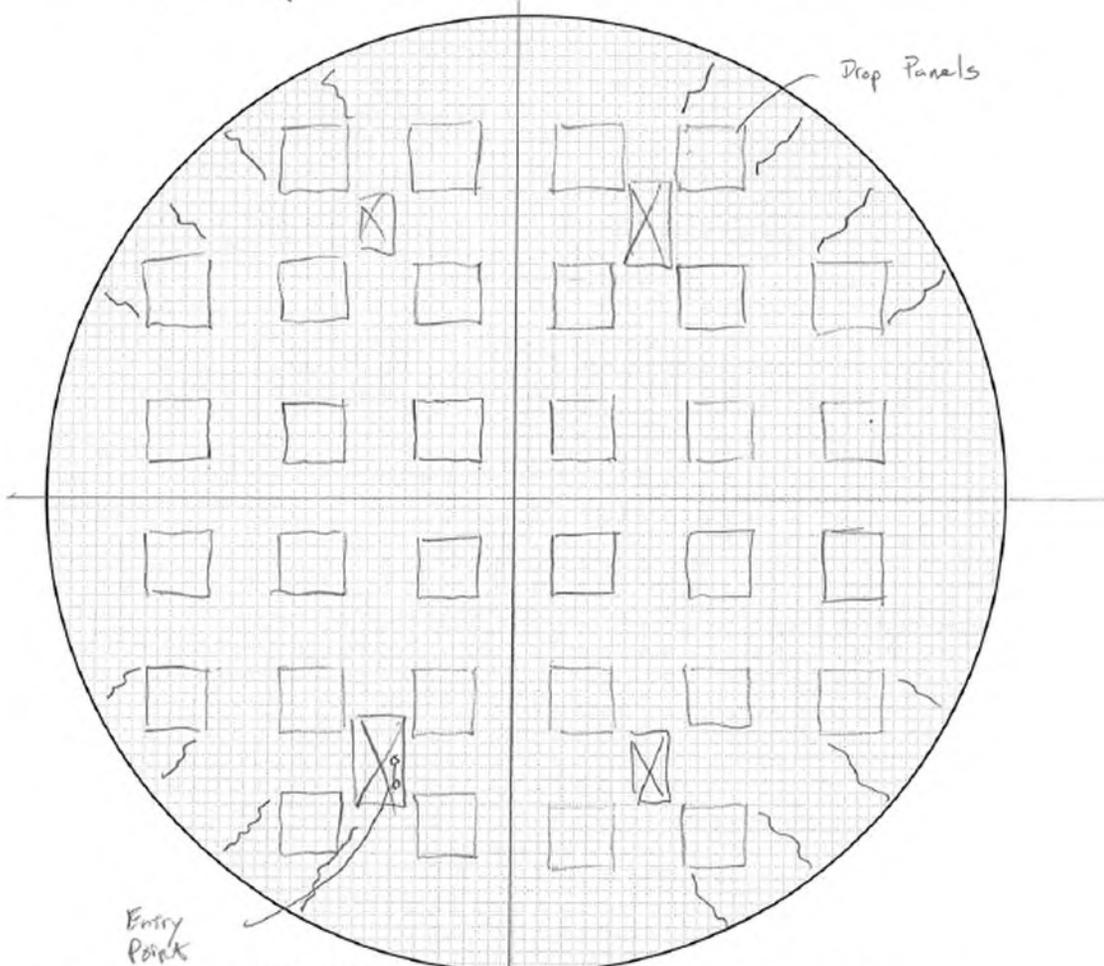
Reservoir INTERIOR REFLECTED ROOF Plan – Note location of columns, hatches, ladders, and manways (if present). List given and measured diameter. (Note columns on next sheet)
